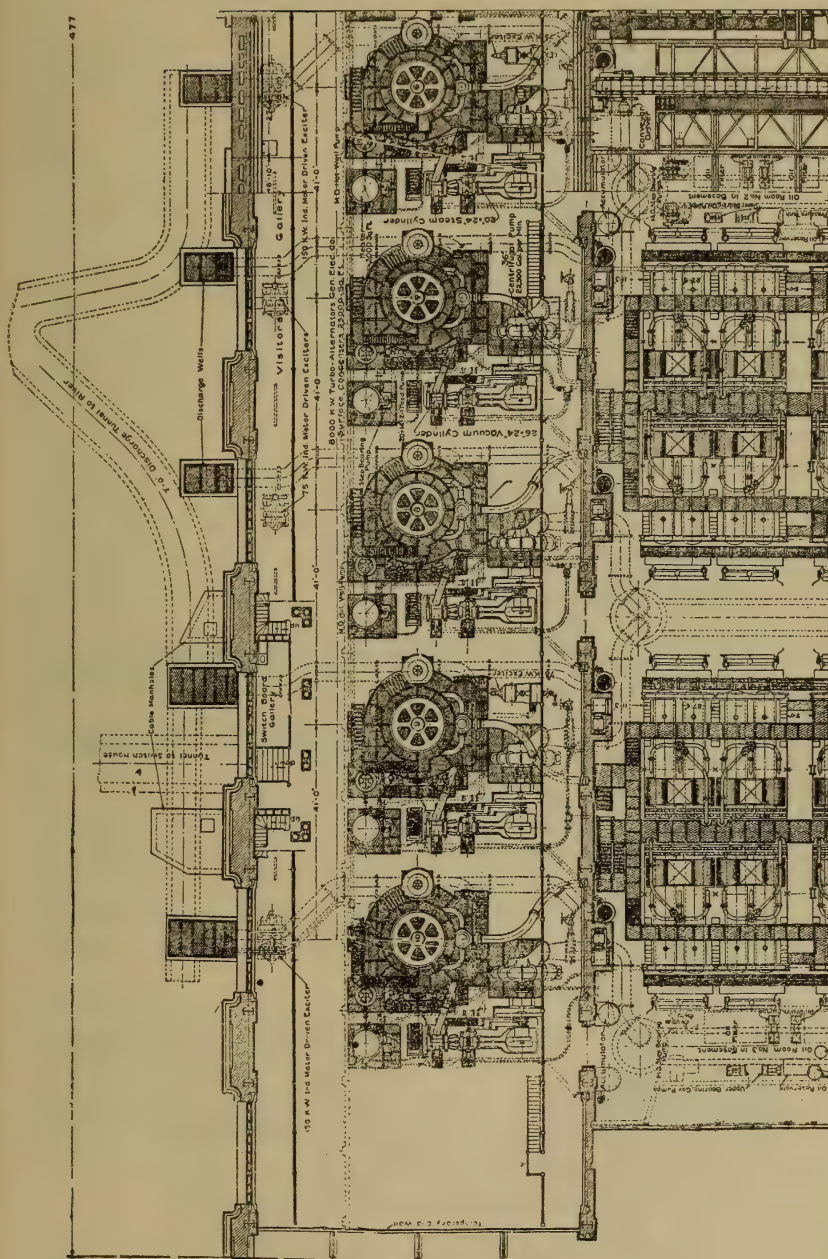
General Plan of Units 6 to 10, Fisk Street Station.
